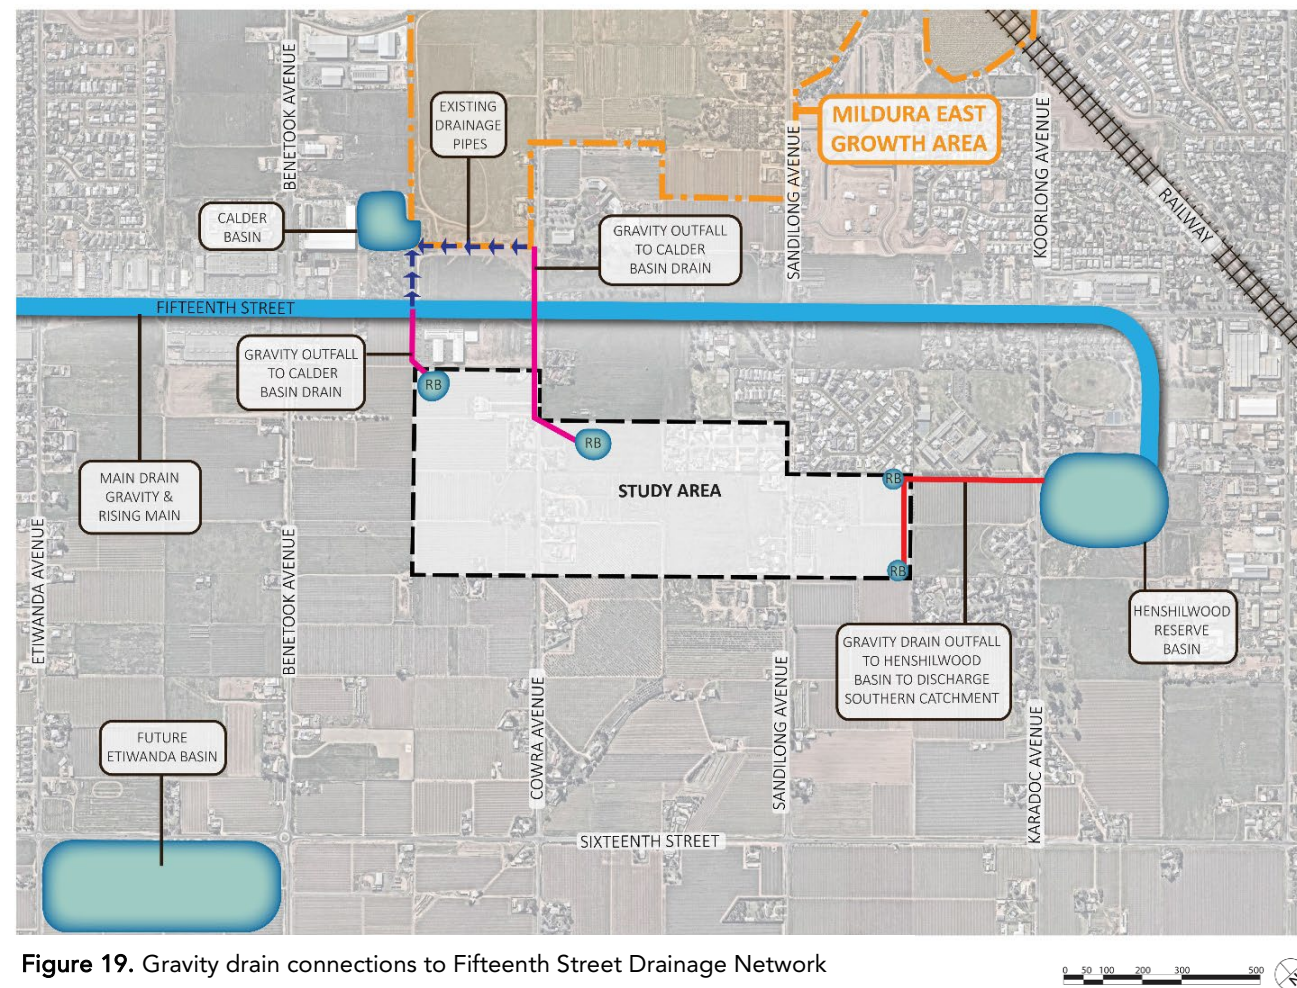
Gravity drain connections to Fifteenth Street Drainage Network
